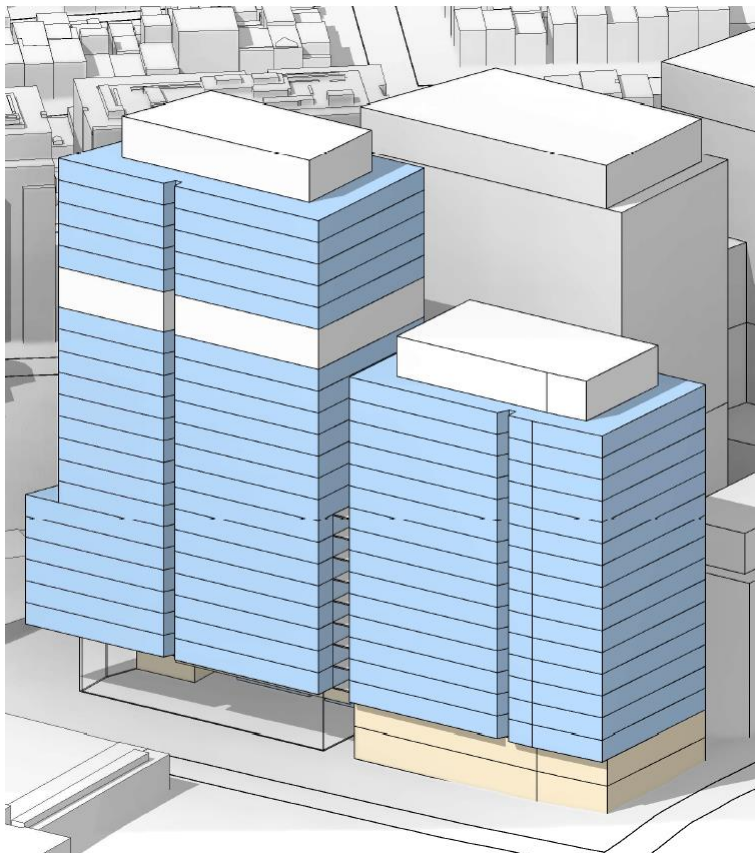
Perspective of Botany Road site showing the skybridges connecting the podiums
